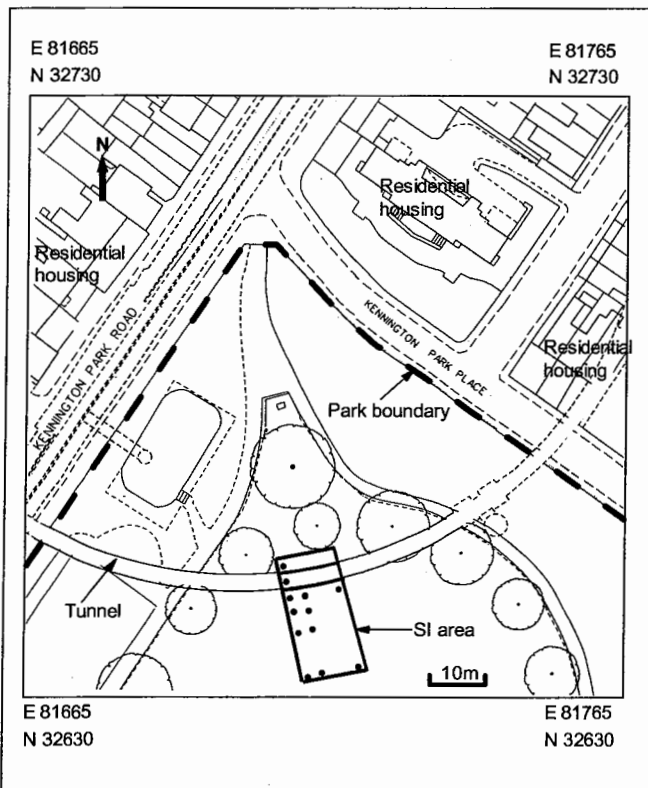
Plan of site investigation area and surroundings showing the position of the tunnel
